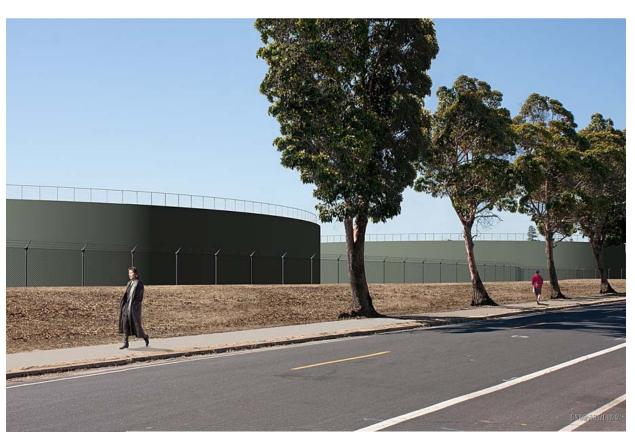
D Ardley Ave Looking South East - Visual Simulation After Construction, Before Planting
